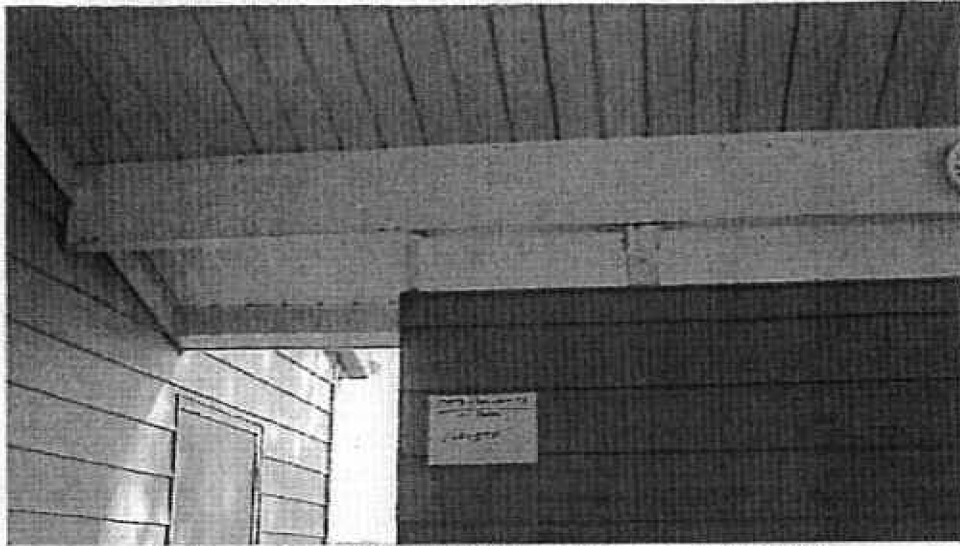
Green Wood Soffit and Beams (LHA-59F)
